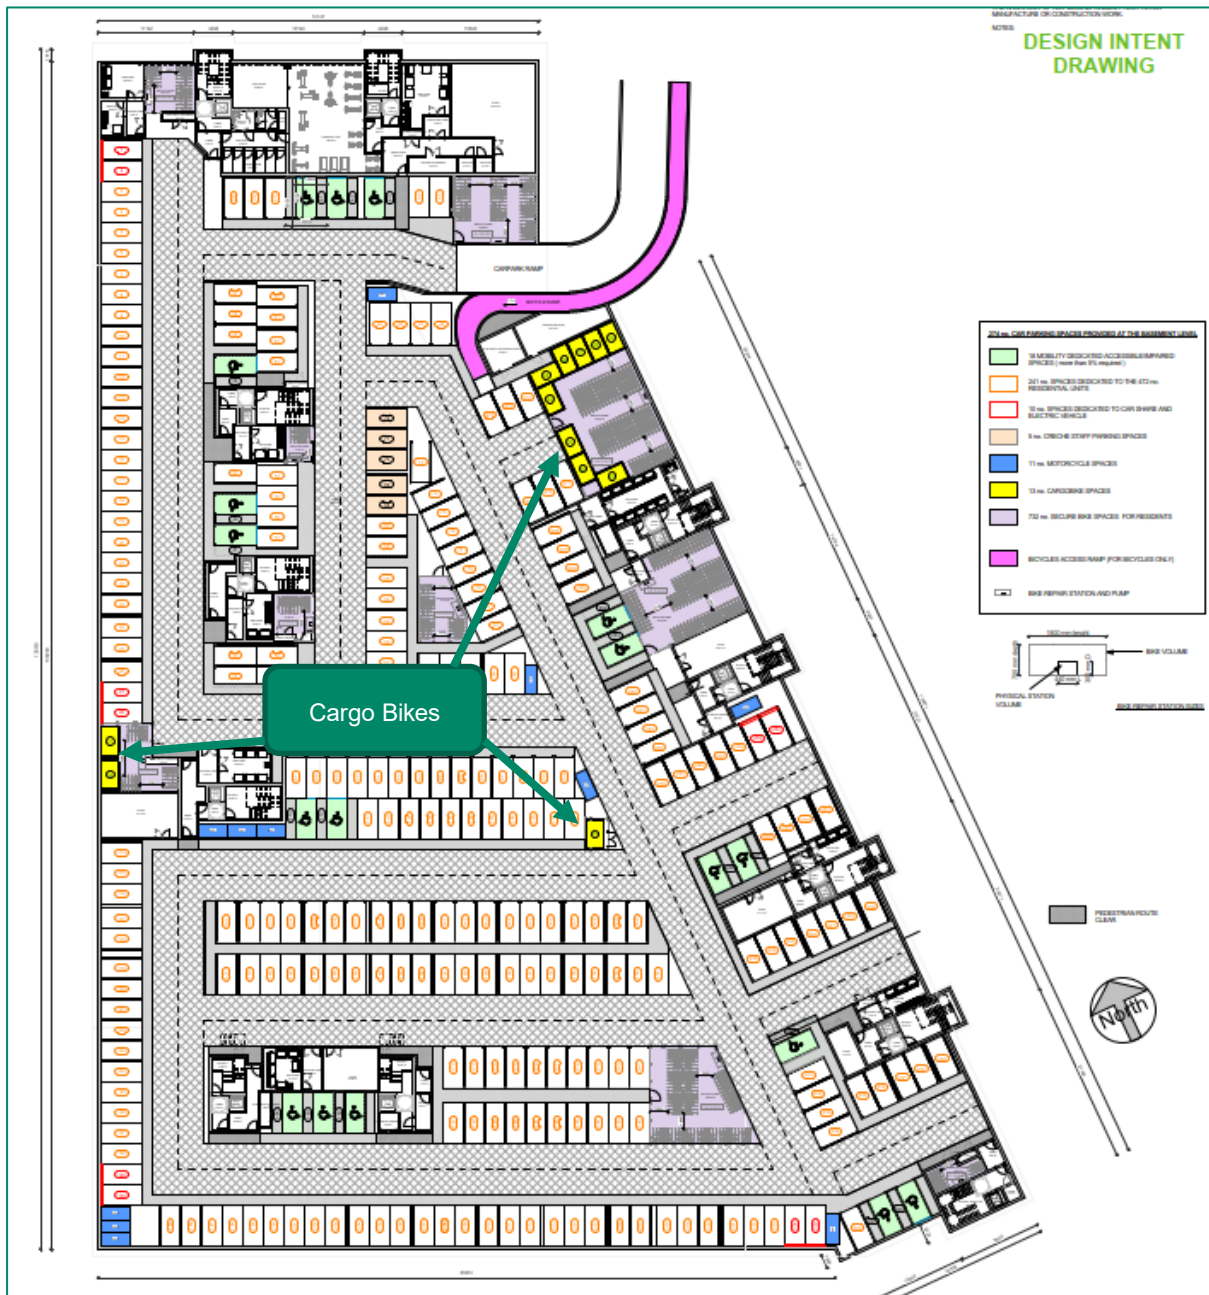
Cargo Bike Store Parking Basement Layout (Source: C+W O'Brien Architects Drawing No. 092035)
